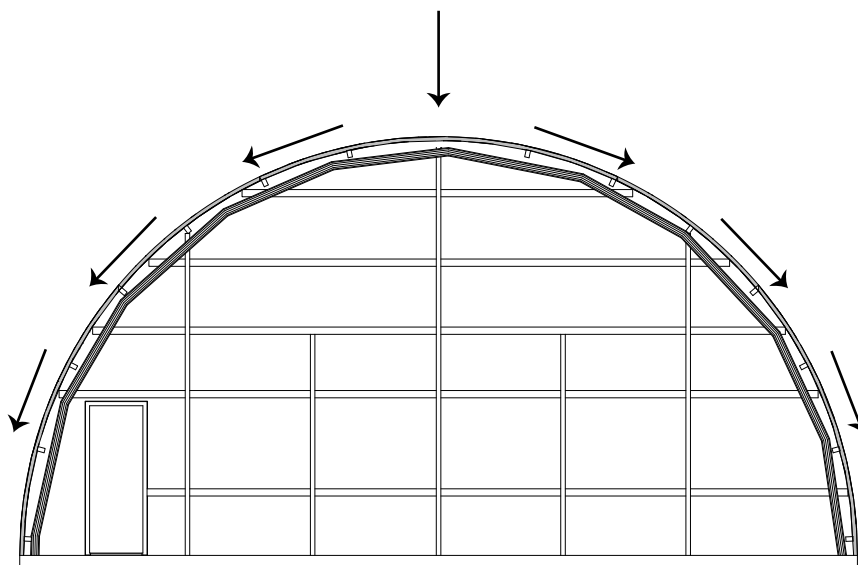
Force diagram of the Romneyloods (building 512) 1:100
